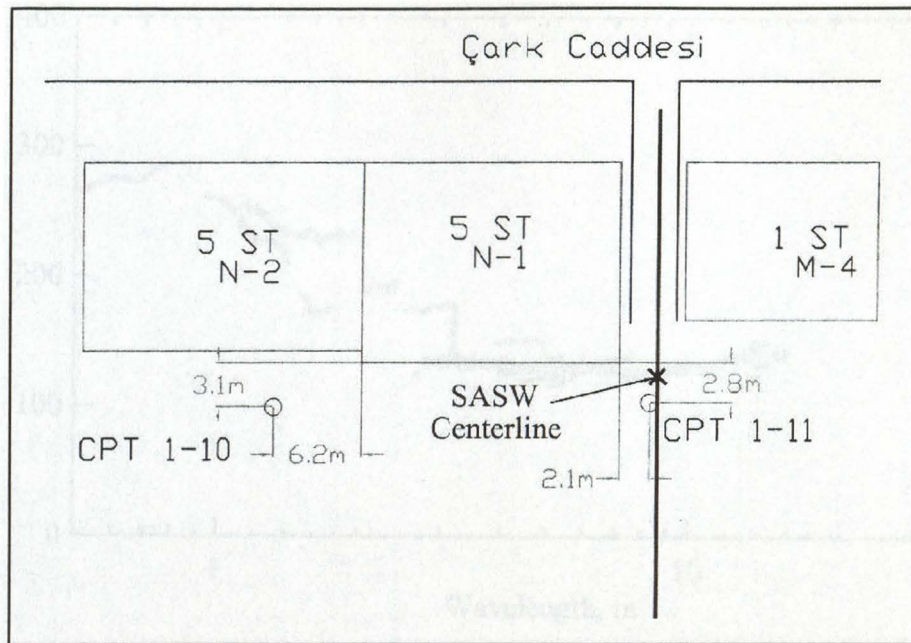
Plan view of Site 1-11 showing the location of one SASW centerline (modified from [www.eerc.berkeley.edu/turkey/adapazari](http://www.eerc.berkeley.edu/turkey/adapazari)).
